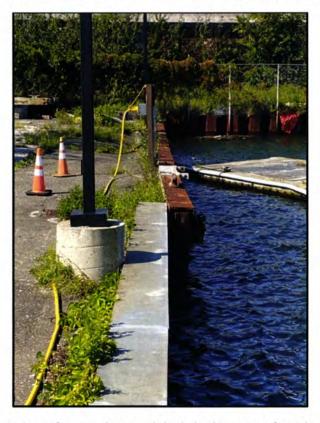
Close-up view of storm damaged dock, looking west from bulkhead Sta. 3+00
